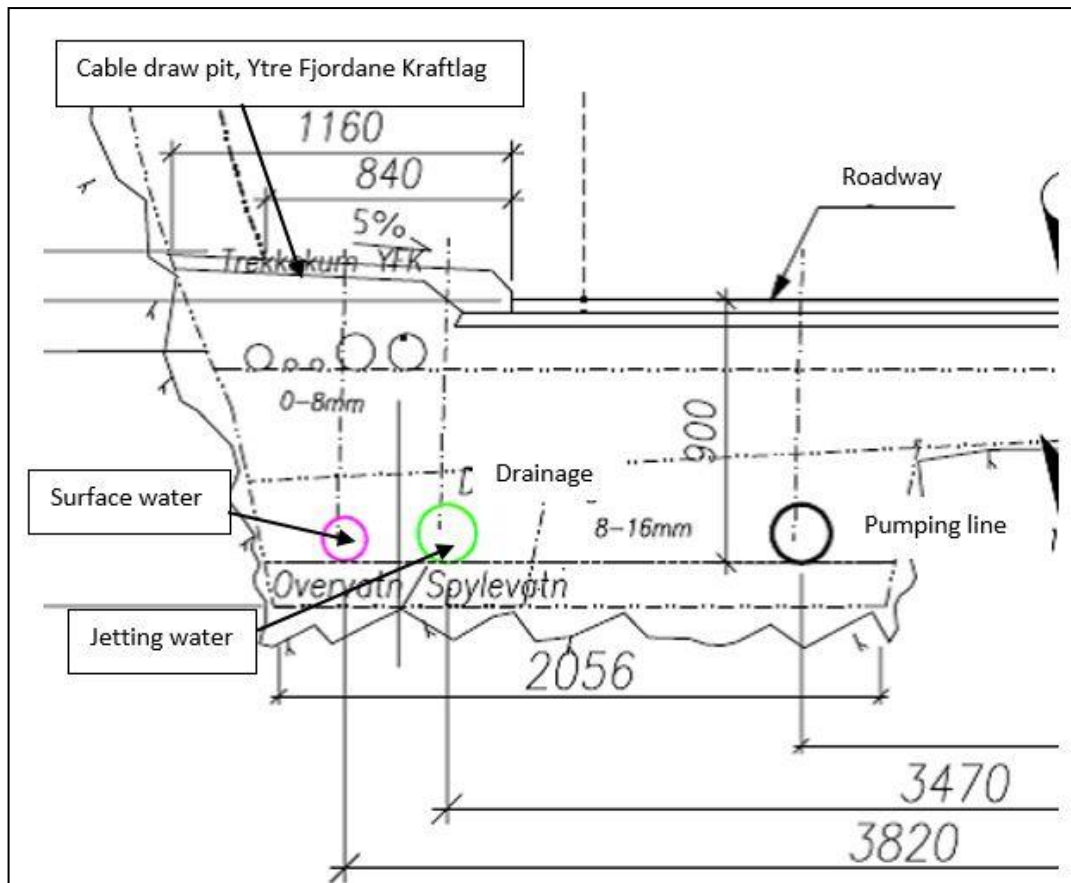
Section of the construction drawings showing the road's drainage system in cross section. Source: the NPRA
